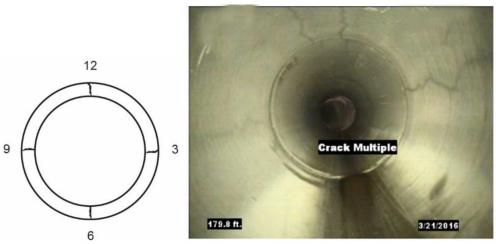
Hinged Cracks (Multiple Longitudinal Cracks)
